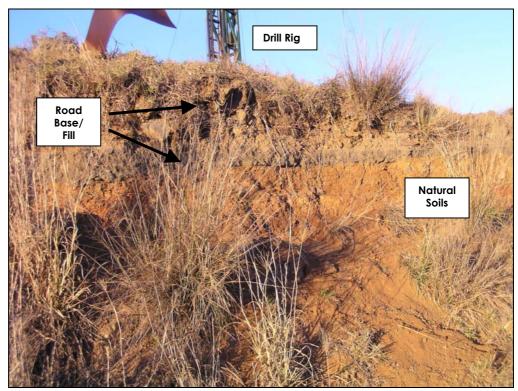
View looking south at profile of bank down slope (approximately 2-3m below Test Bore 3 surface R.L) showing fill and road base above natural soils.
